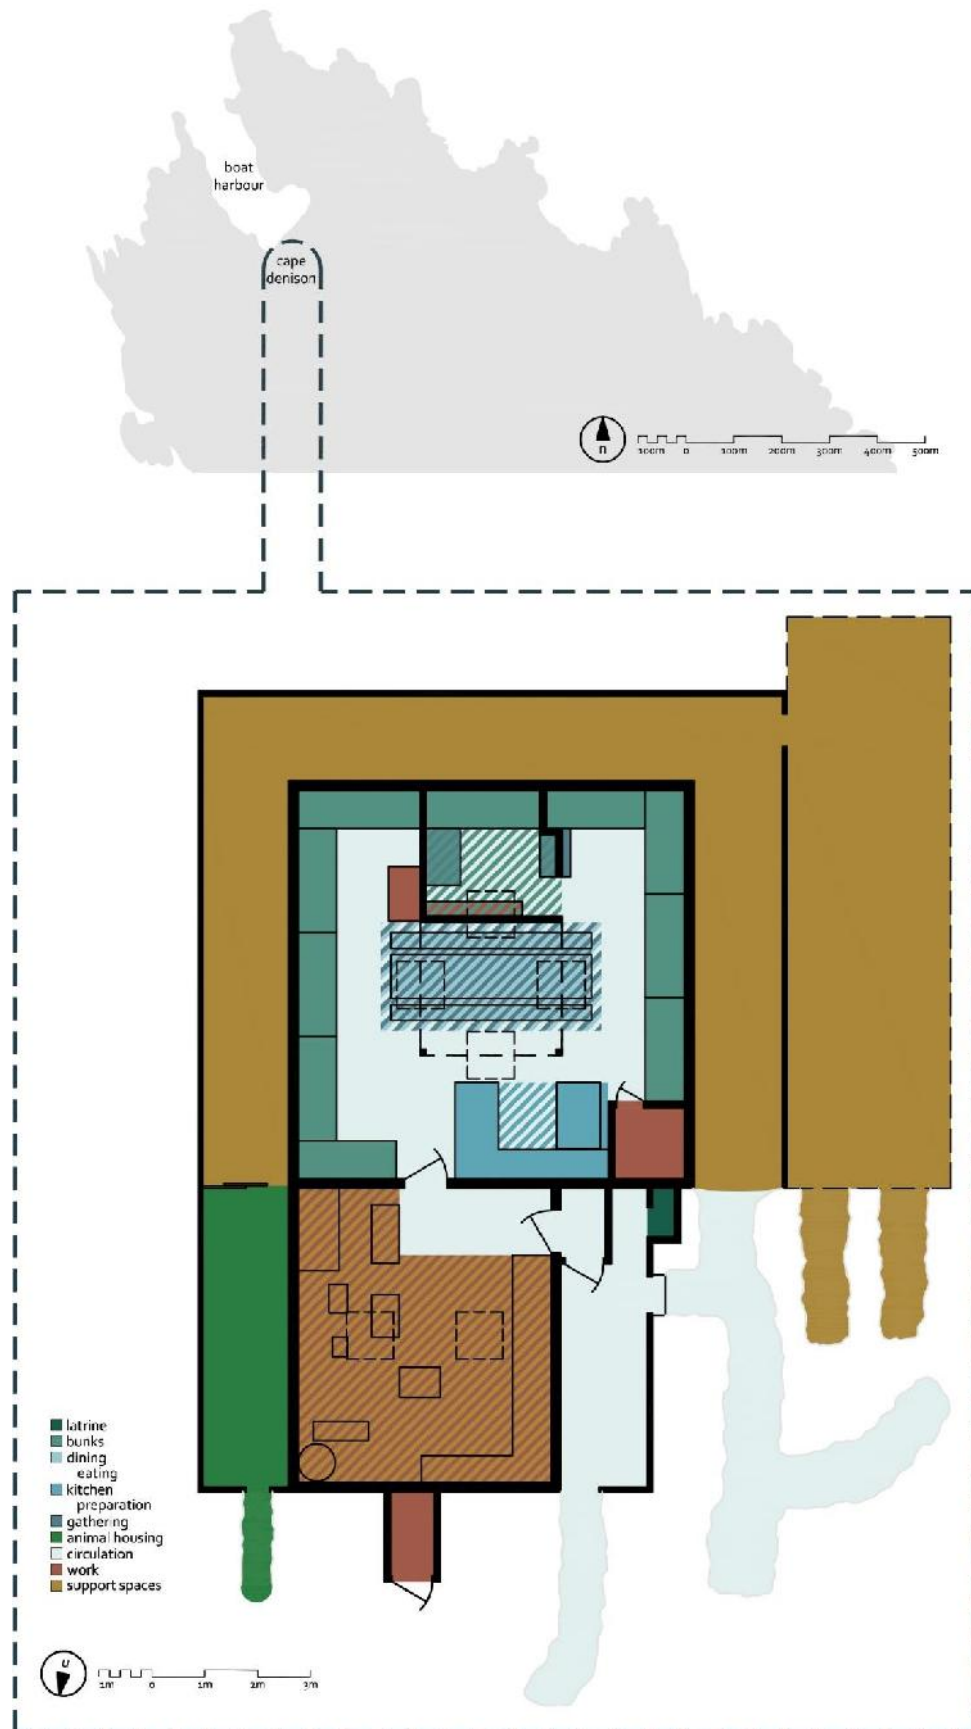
Mawson's Huts – Site, Orientation, Floor Plan¹⁸⁸
